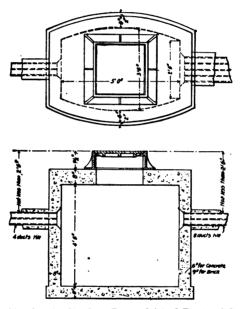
Vault Size 3 to be Used on Runs of 4 to 8 Ducts of Conduit when not Intersected.
